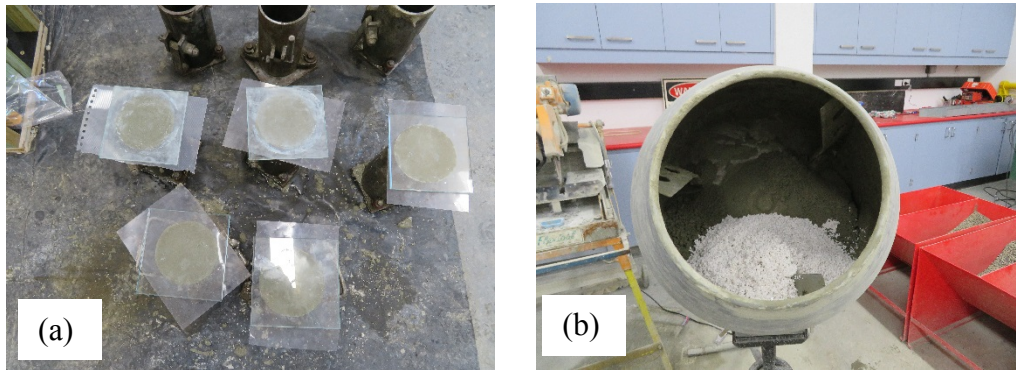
Concrete specimens (a) cylinder preparation and (b) mixing of perlite concrete
